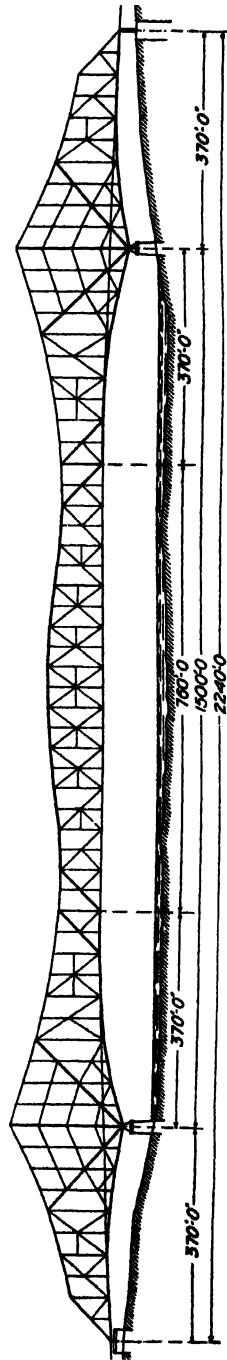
Proposed Highway Cantilever Bridge of 1,500 Feet Span across the Mississippi River at St. Louis.
